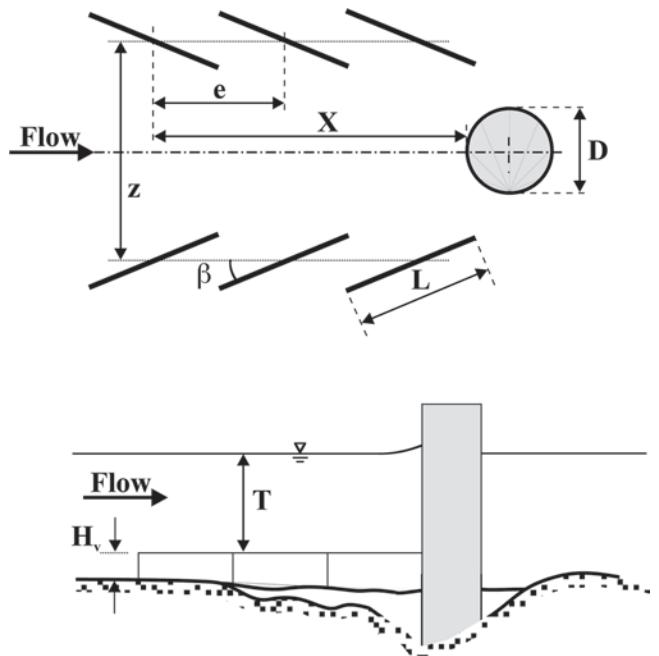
The use of Iowa vanes as a pier-scour countermeasure.
